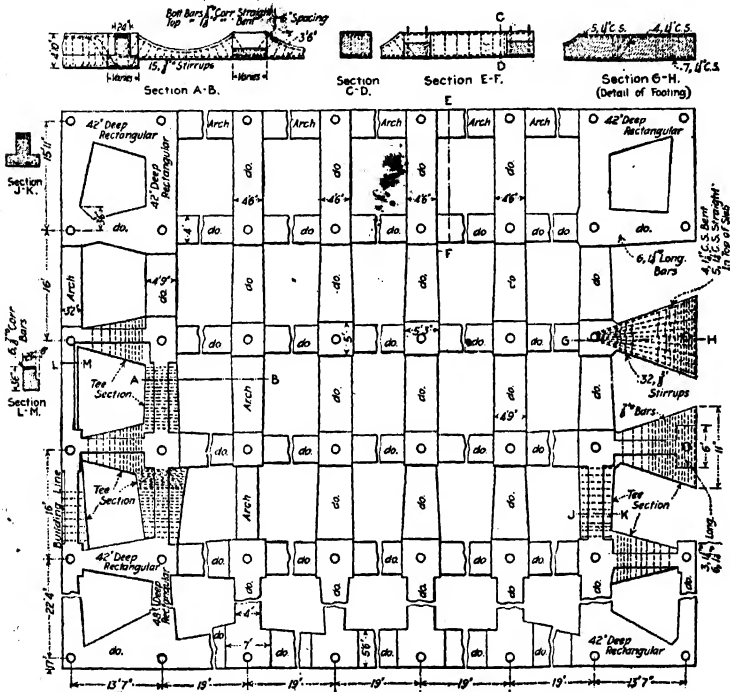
Reinforced concrete arch foundation under a warehouse, New York.
